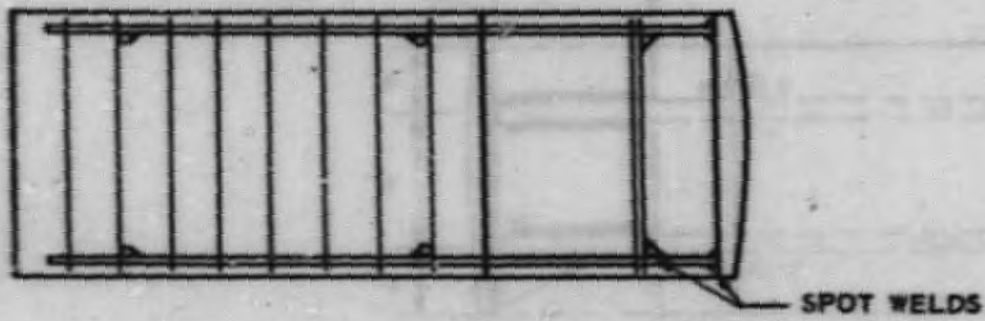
REINFORCEMENT OF TEST SPECIMEN
